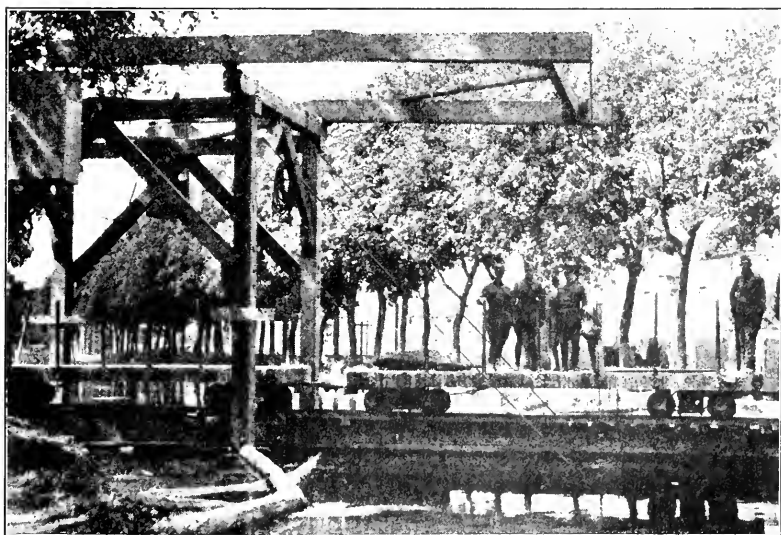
LIFT BRIDGE OVER CANAL AT VOID (MEUSE).
